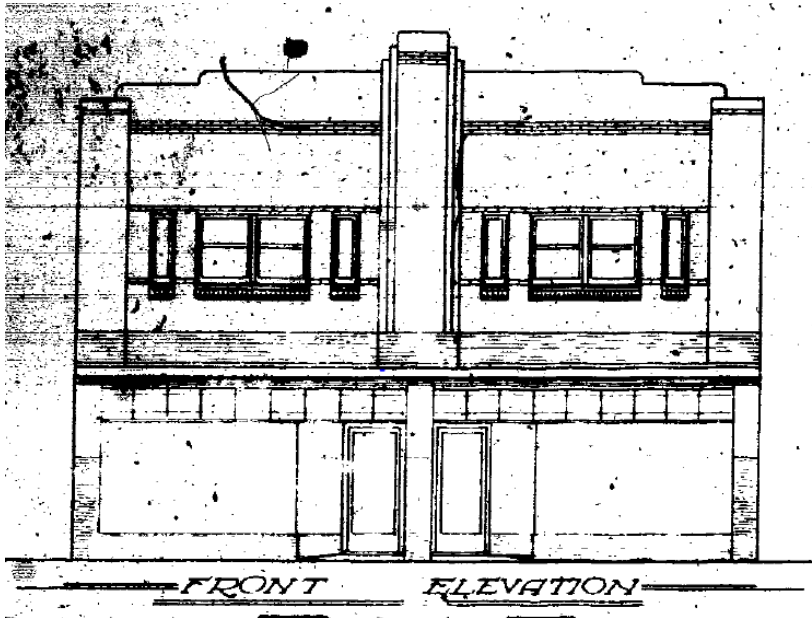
Architectural drawings for 237-239 High Street, which appear to show an earlier design for the building (Source: City of Camberwell building permit plans).
